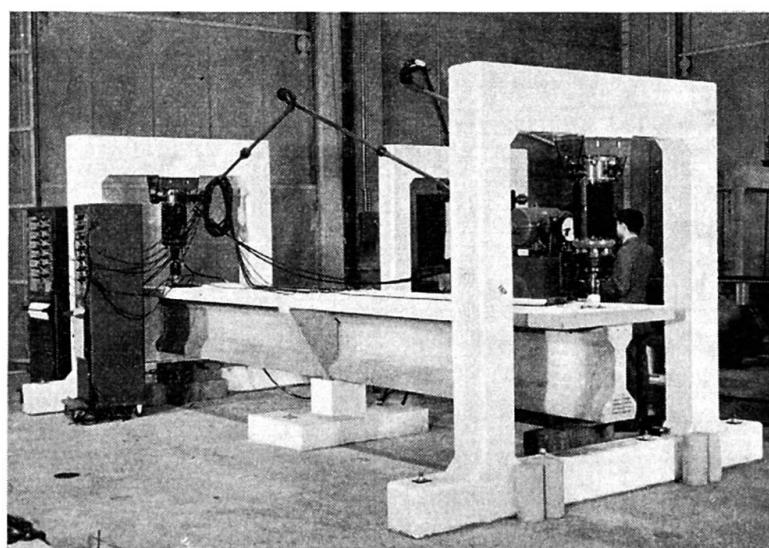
Repeated Load Test of Connection between two Precast-Prestressed Girder Stubs.
